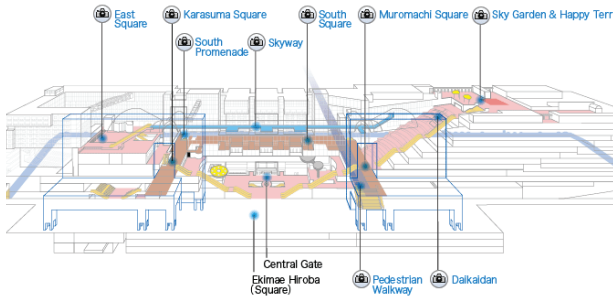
3-dimensional plan of Kyoto Station highlighting pedestrian paths through station
